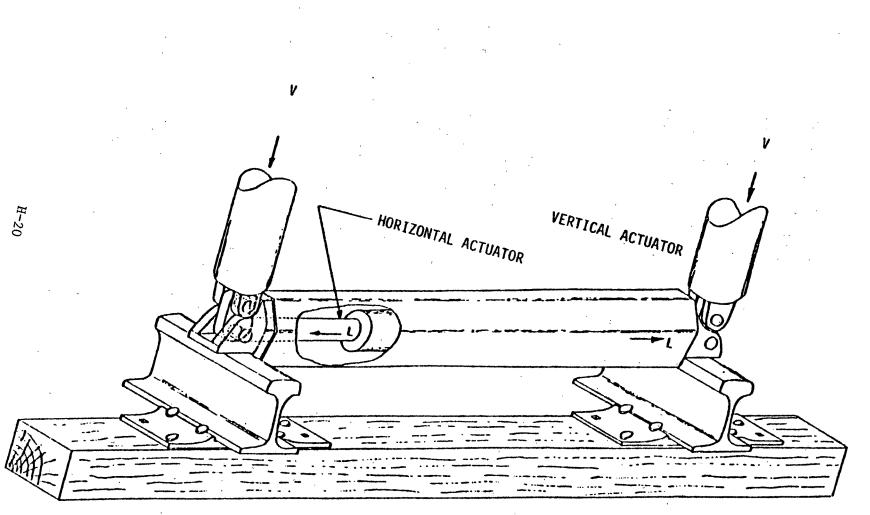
BASIC LAYOUT OF TRACK LOADING FIXTURE .
